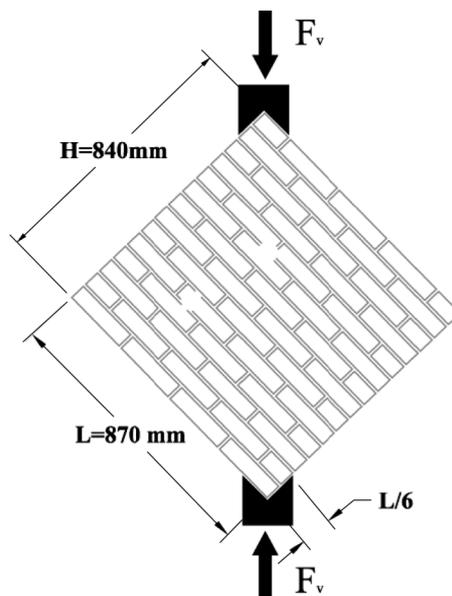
Geometrical configuration and boundary conditions for masonry panels
